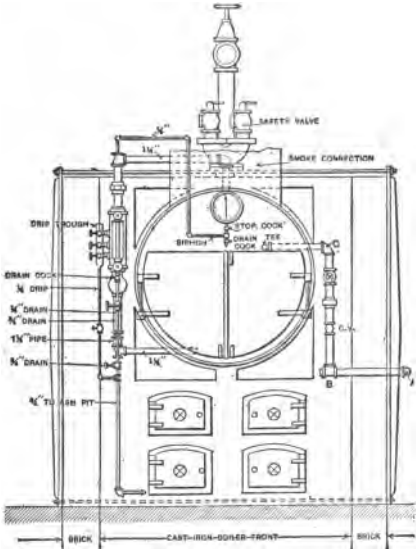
Horizontal Tubular Boiler, Front Connections
